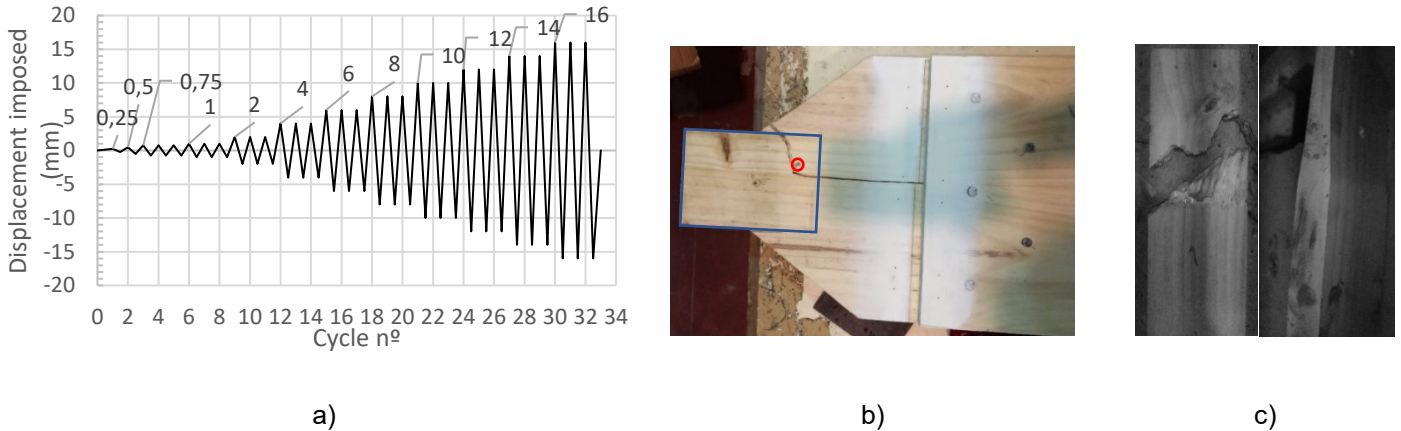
a) Loading protocol b) Rupture of PREG-C due to mounting screw and place where the steel plate was installed c) Rupture at the support with the equipment of COL-C
